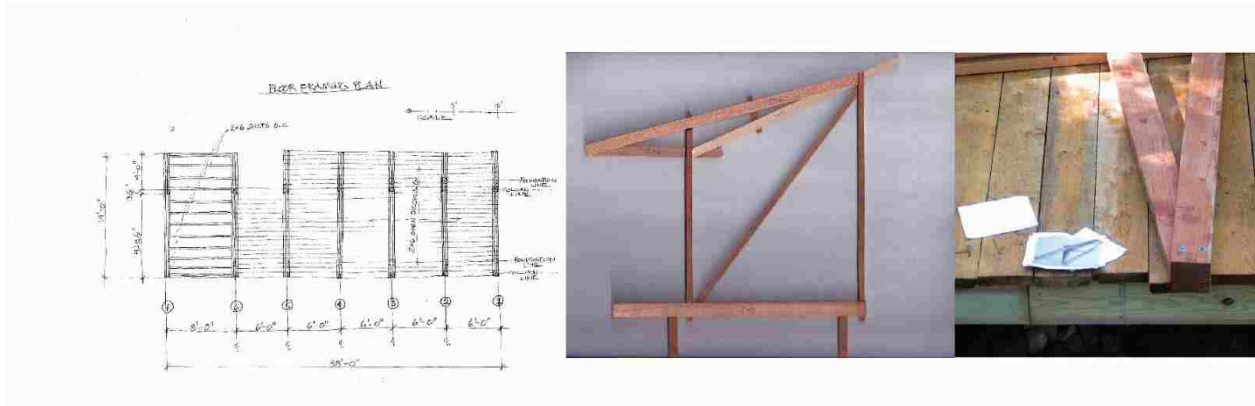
Floor plan, Truss Model and Construction Photo of Bunk House.
